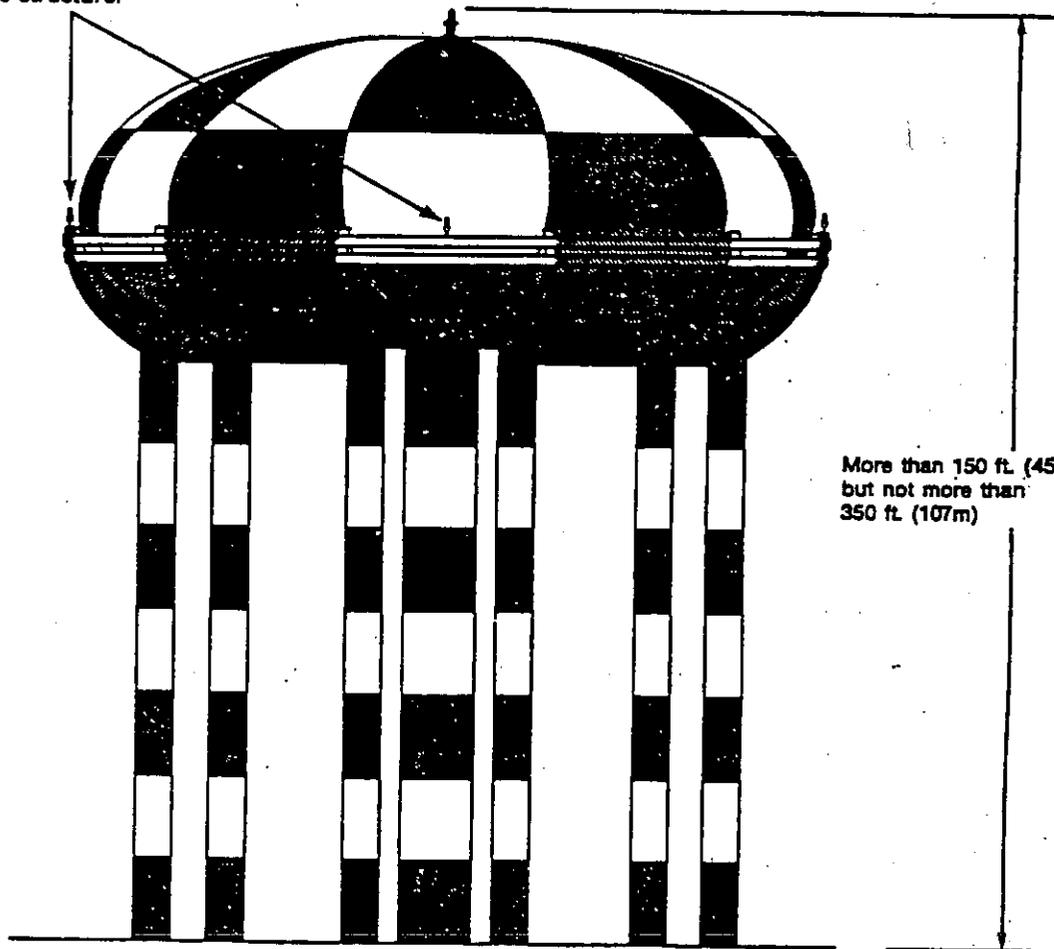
FAA's recommended marking of water towers, storages tanks, or similar structures.
